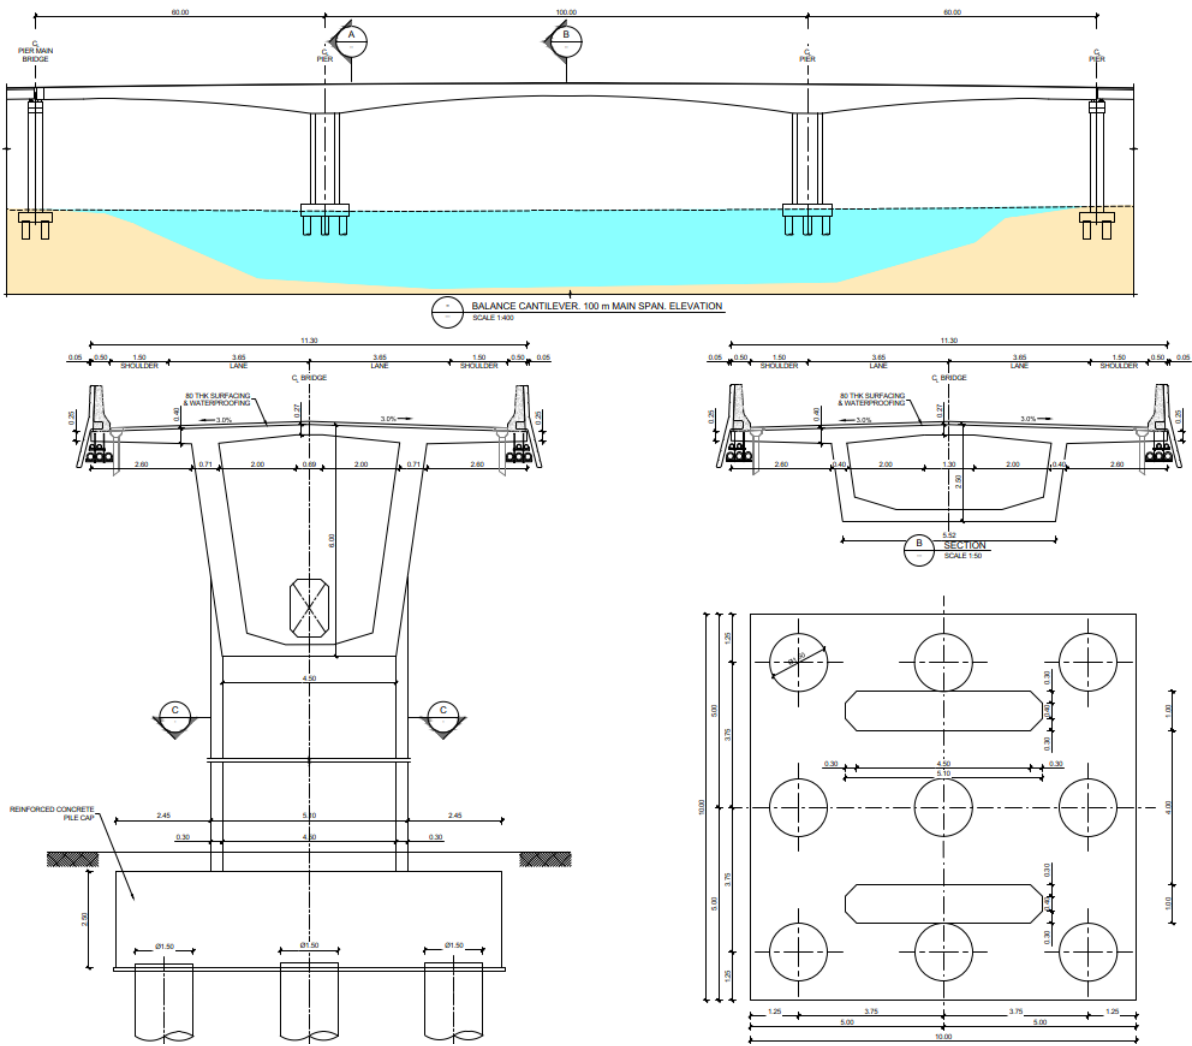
Elevation of the balanced cantilever spans for Netrokona-Sunamganj elevated road.
